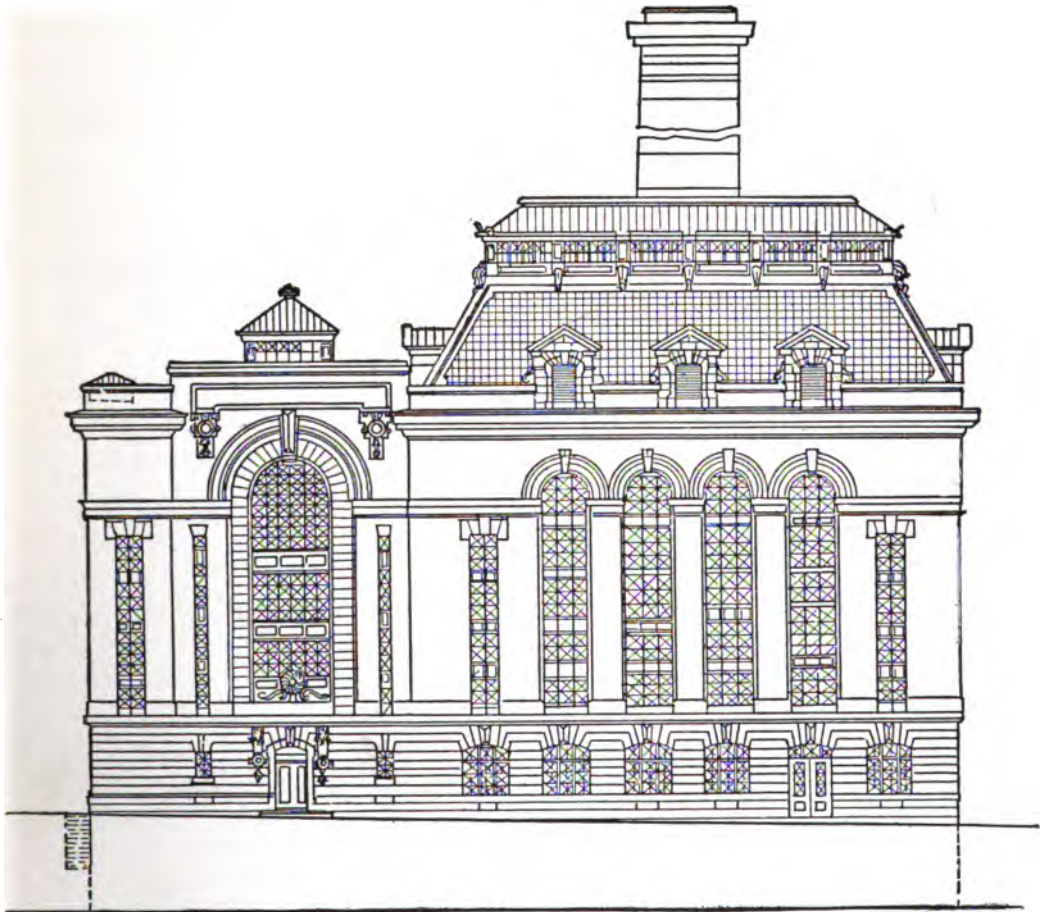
Façade of Waterside Plant No. 2, New York (*Electrical World*).
